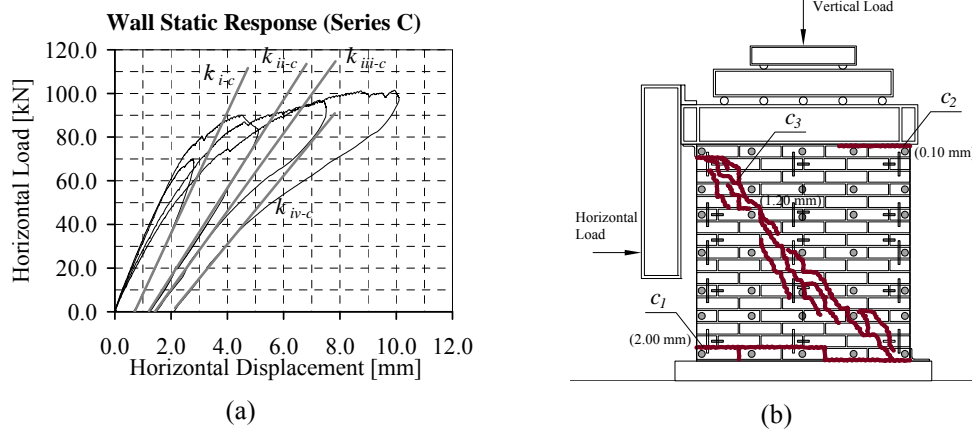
Wall static tests for the last test series: (a) static structural response; and (b) the final crack pattern
